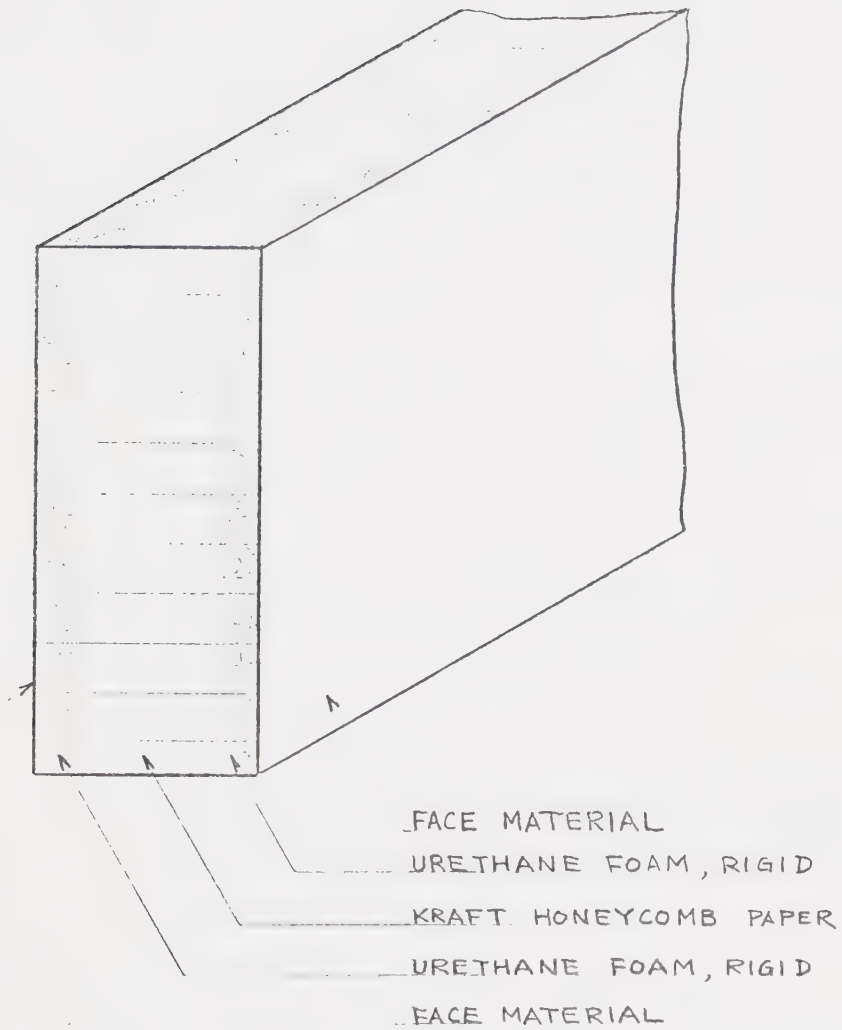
A TYPICAL CROSS-SECTION OF THE PANEL
